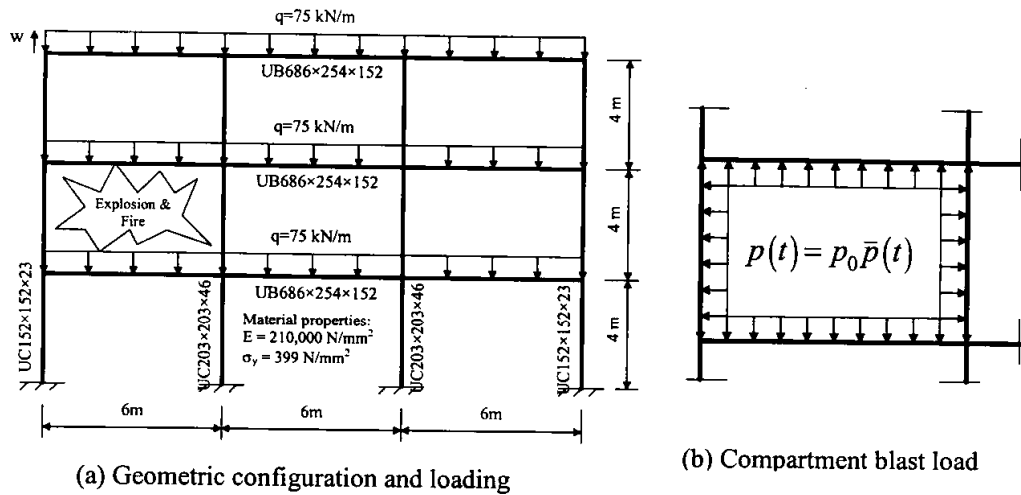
Geometric configuration and loading of 3-storey steel frame
